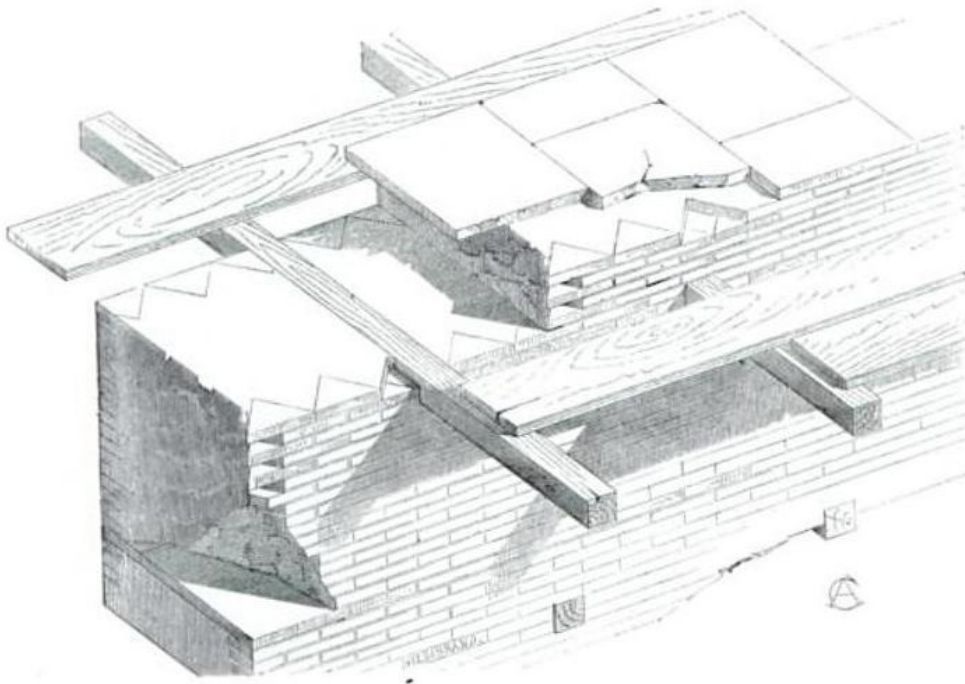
Construction of a Roman concrete wall: external facing made of half- bricks acting as shuttering; cross-timbers tying layers of wall together and supporting scaffold; regular horizontal layers of *bipedale* bricks, again tying the wall together and helping level the works. Study and drawing by Choisy (1873).
